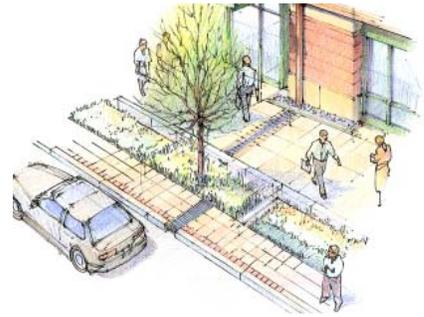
Rain garden along an urban street that collects rain water from abutting rooftop down spouts
